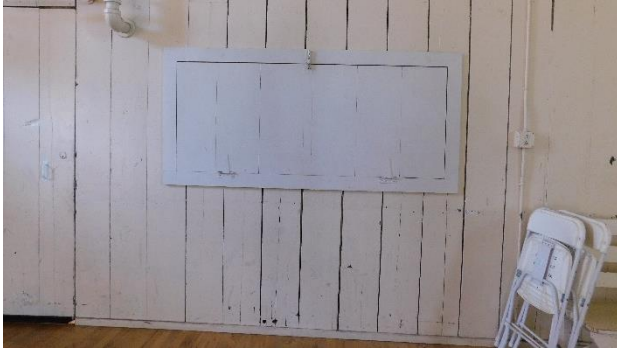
Pass-through between kitchen and main hall, as viewed from the main hall.
